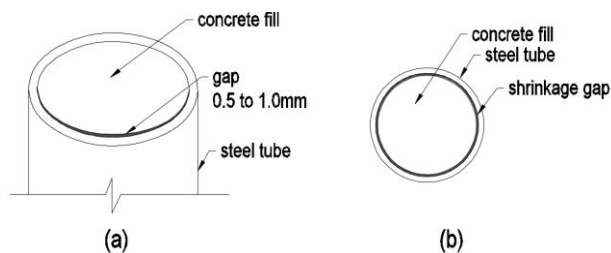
(a) Slippage between steel tube and core concrete due to loading, (b) Shrinkage gap between steel tube and concrete
